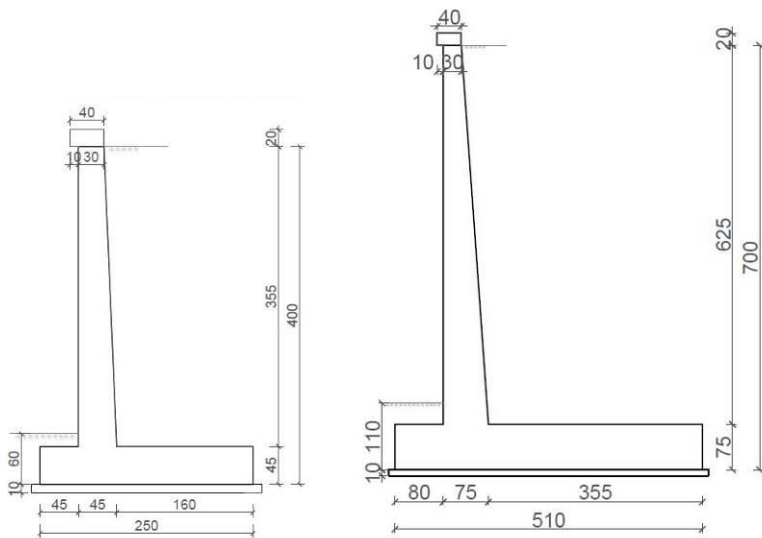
Typical cross-section of reinforced concrete walls for heights of H=4.0 m and H=7.0m
